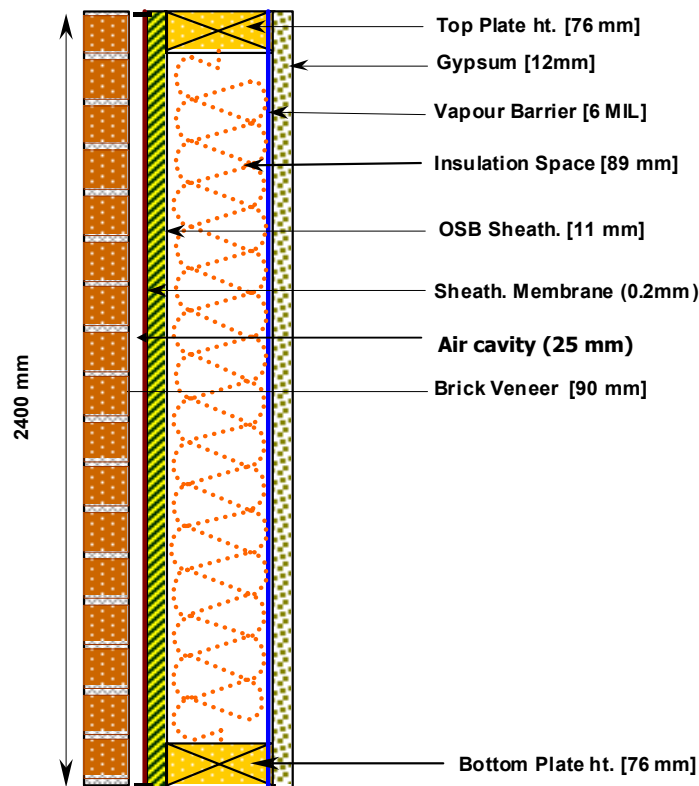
A vertical section showing the composition of the wall used as the reference for the parametric study.
